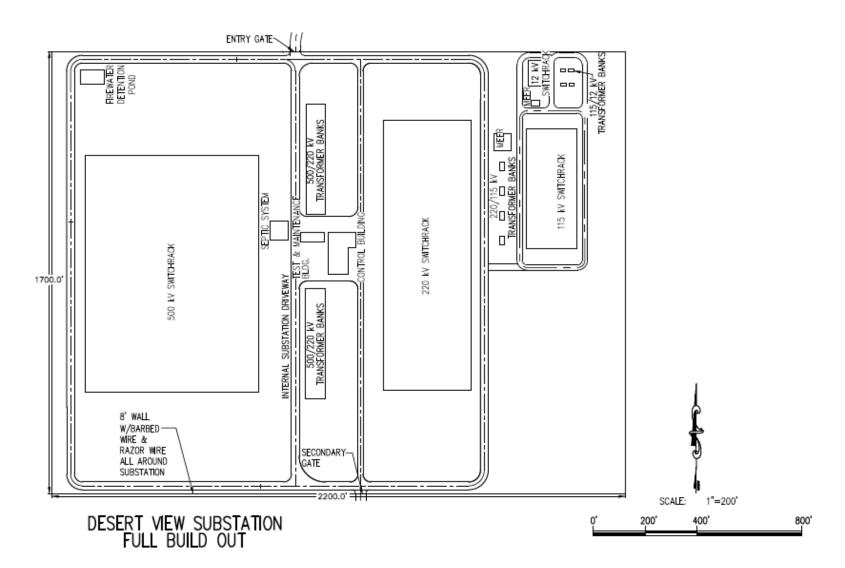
A-b Proposed Desert View Substation Layout for Full Build Out
